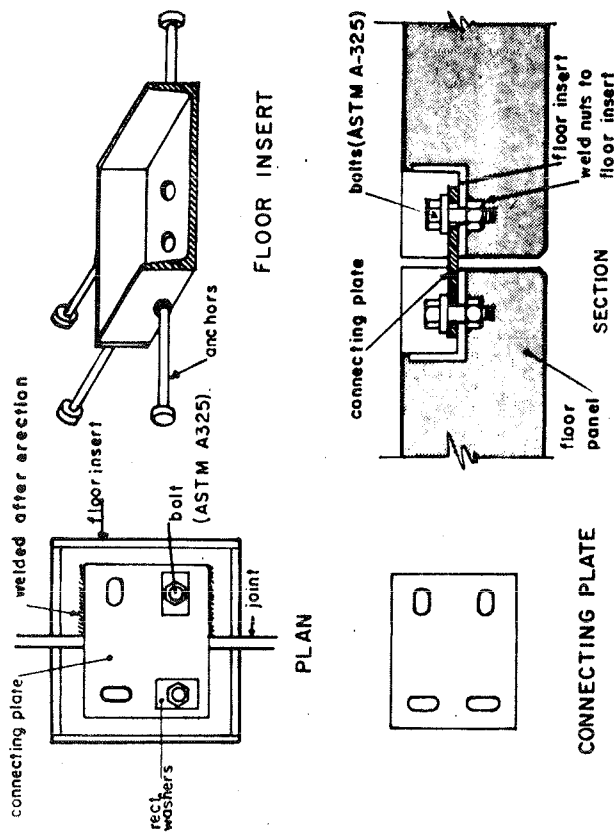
FLOOR-TO-FLOOR-OR WALL-TO-WALL JOINT
